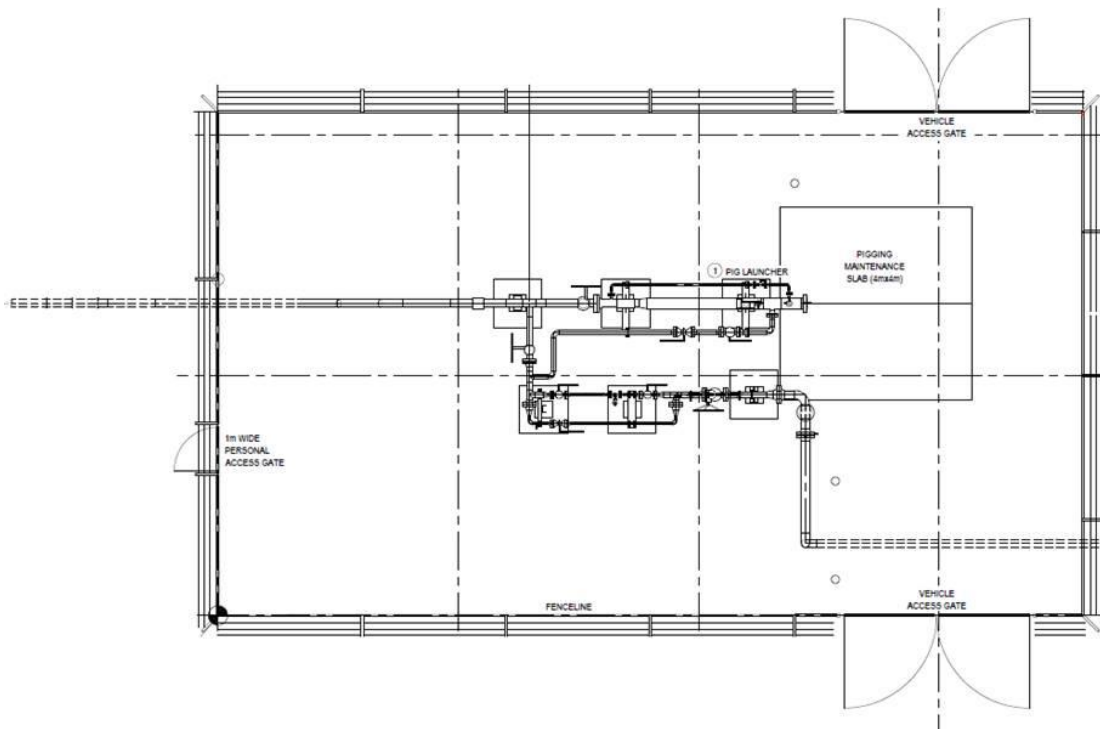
Typical Layout Schematic for the Shenandoah Facility
